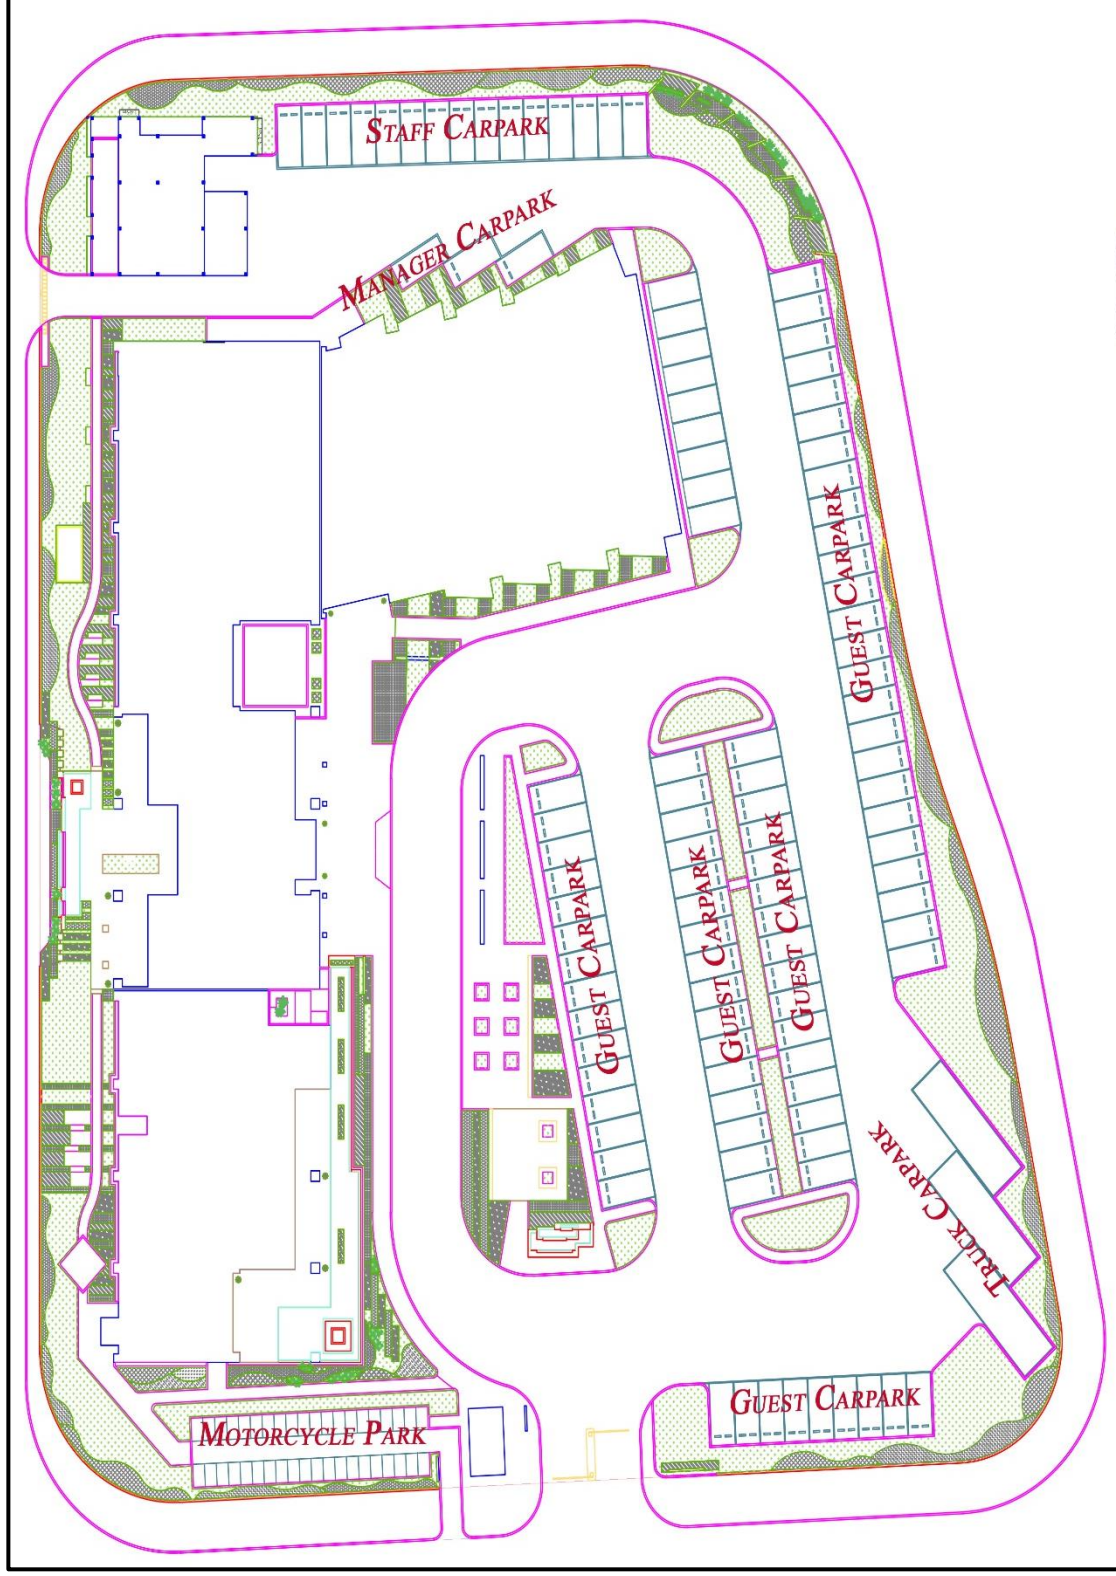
Car Parking Layout Plan (15,068 ft<sup>2</sup>)
